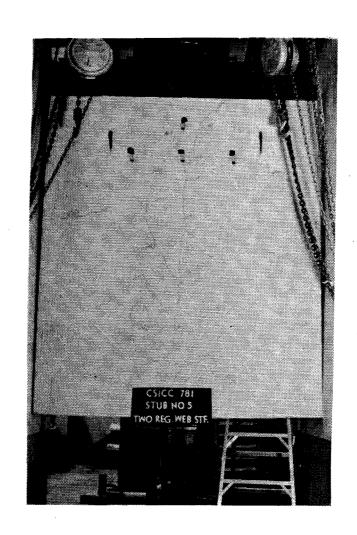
Cracking Pattern in Slab of Stub Specimen V
